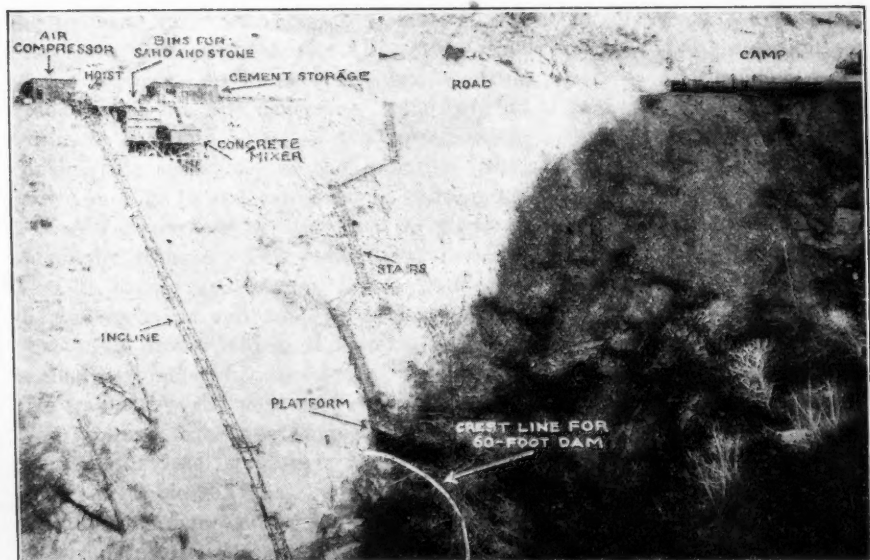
VIEW OF PRELIMINARY WORK AT SITE OF DAM.
